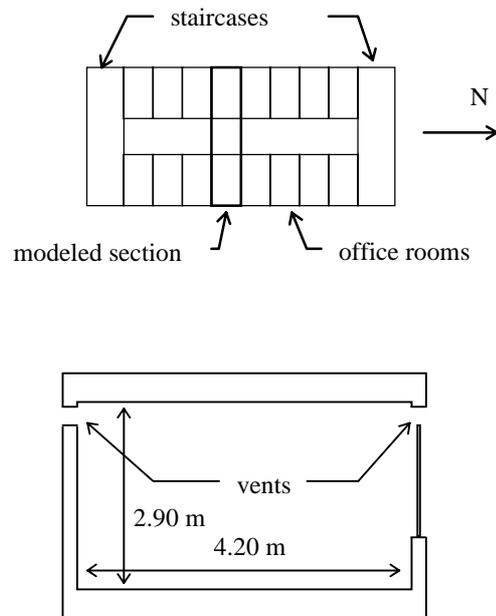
(a) plan of the top floor and (b) a vertical cross section of the office space in question. The width of the office spaces is 2.70m; roof height of the building is 10m above ground level (3 storeys).
